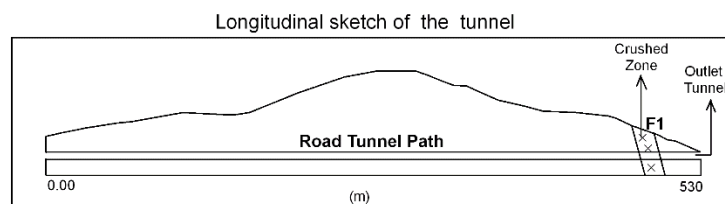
Longitudinal sketch of the Zaker-Sorkhedizaj tunnel showing location of crushed fault zone in the tunnel
